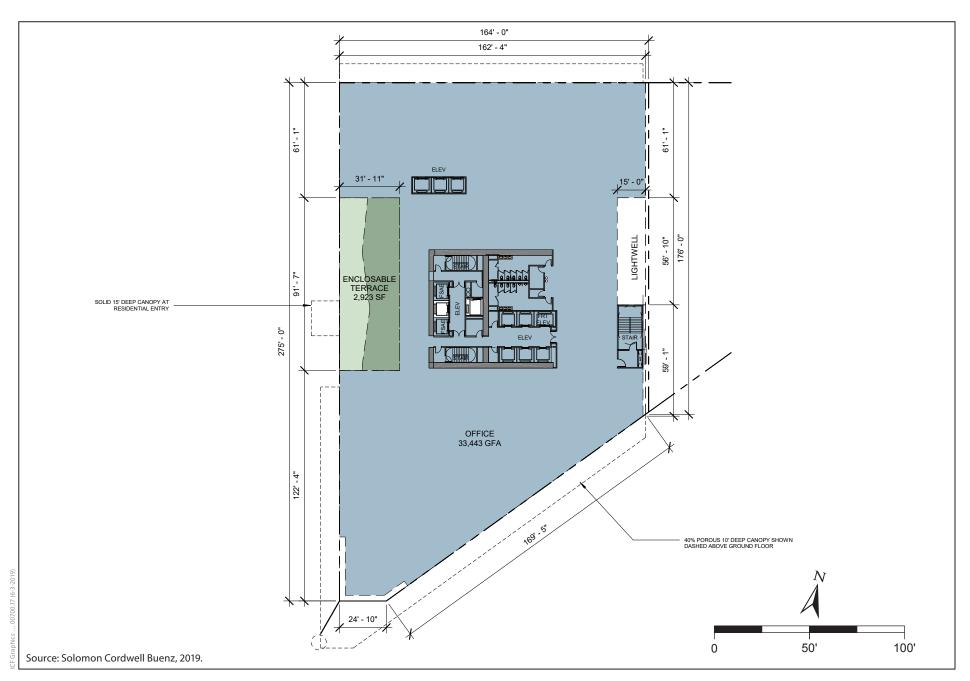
30 Van Ness Avenue Project – Proposed Levels 2–8 Plan
